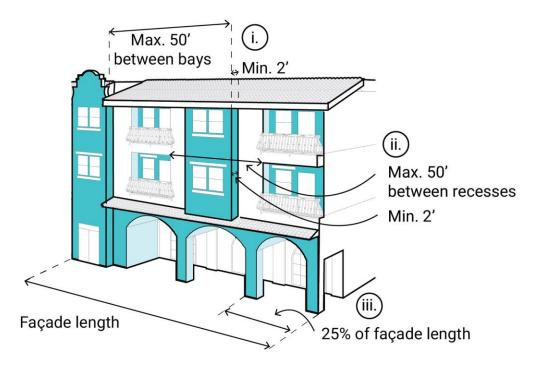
(B)(4)(c): Façades along Mission Boulevard
